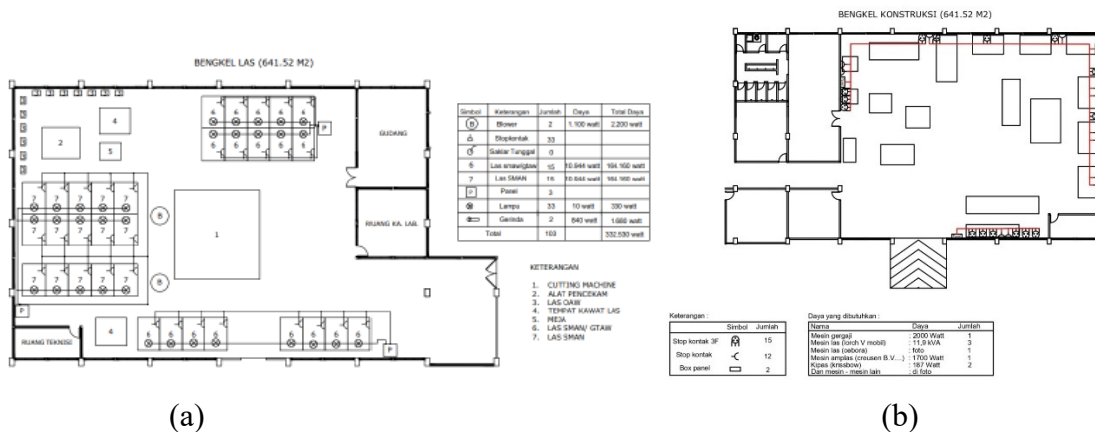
a) a) Wiring diagram of welding workshop, b) Wiring diagram of construction workshop
